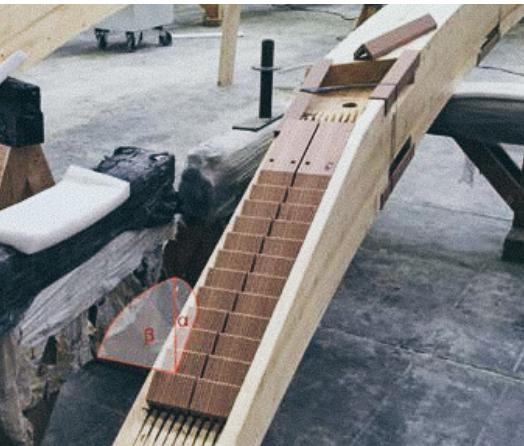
The longitudinal tension joint features toothed beech plywood inlays instead of steel plates. The joint can be engaged within the opening of the teeth.
